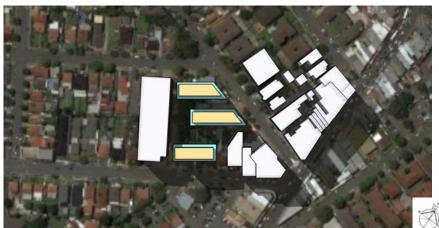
A: Solar Access 3pm for proposed precinct building envelope
